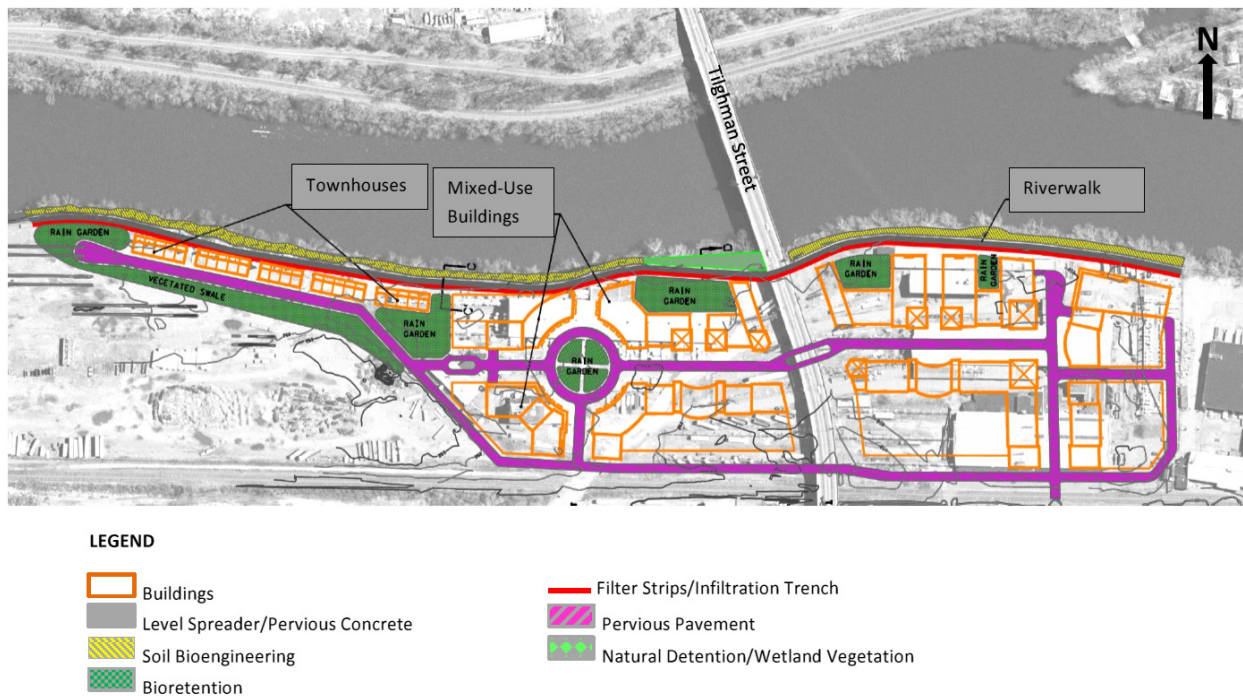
Proposed Green Infrastructure for “Waterfront” in Allentown, PA
